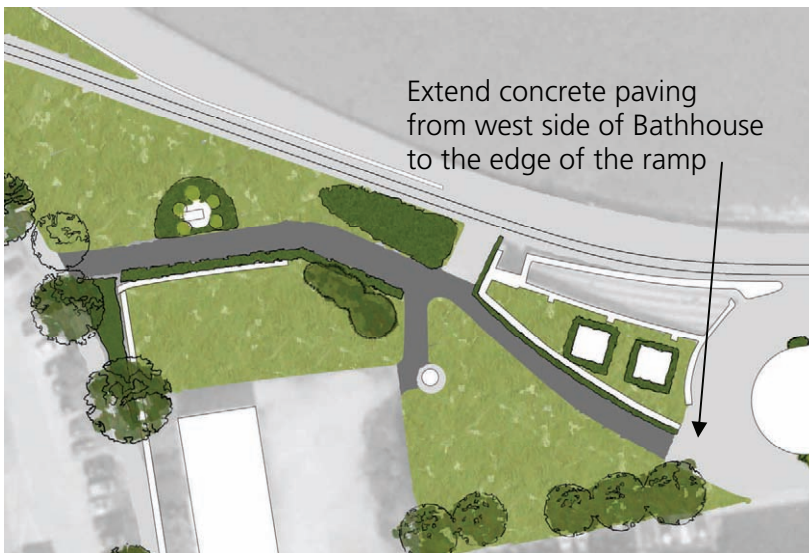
Plan view showing the extension of concrete paving west of the Bathhouse to the beginning of the Upper Promenade. (NPS, 2007)
